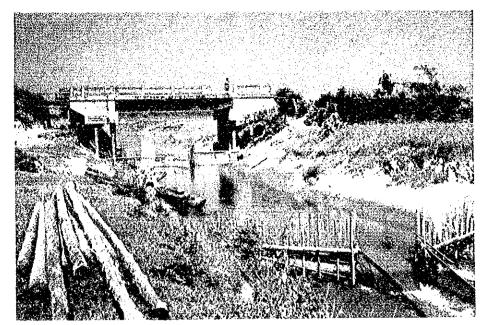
Damage of Bridge Approaches (Washed Away)
